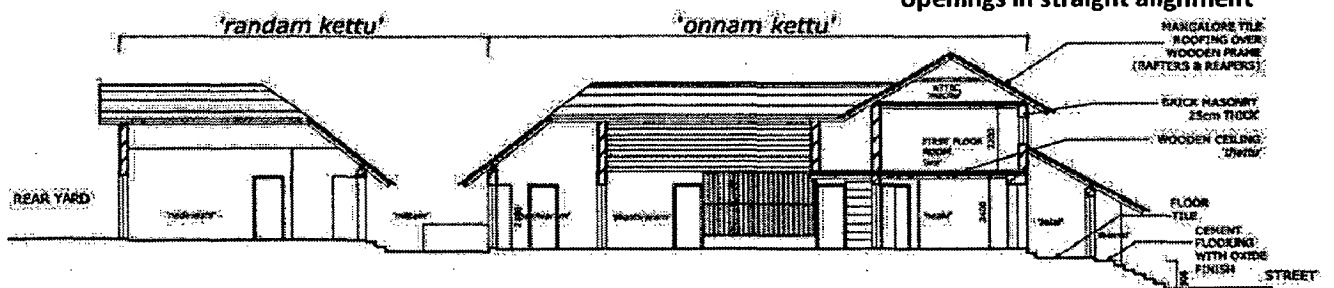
Longitudinal section of residence 1 in Kizhakkencherry Agraharam
